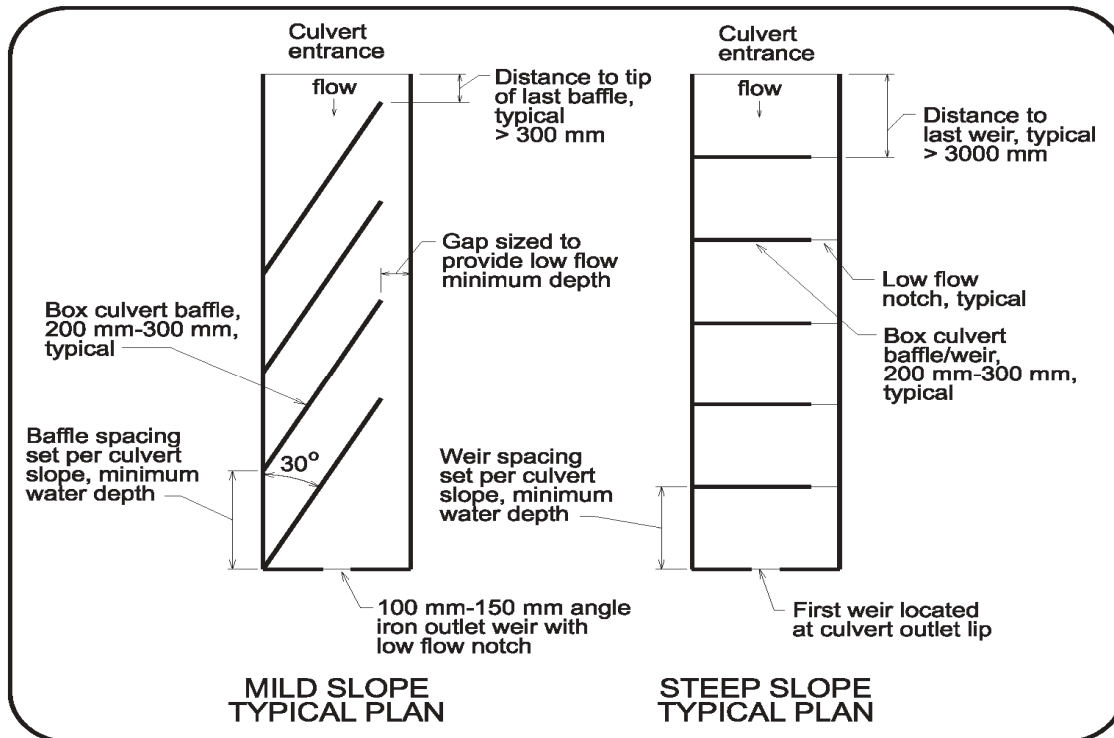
Typical plans for baffled box culverts on mild and steep slopes.
